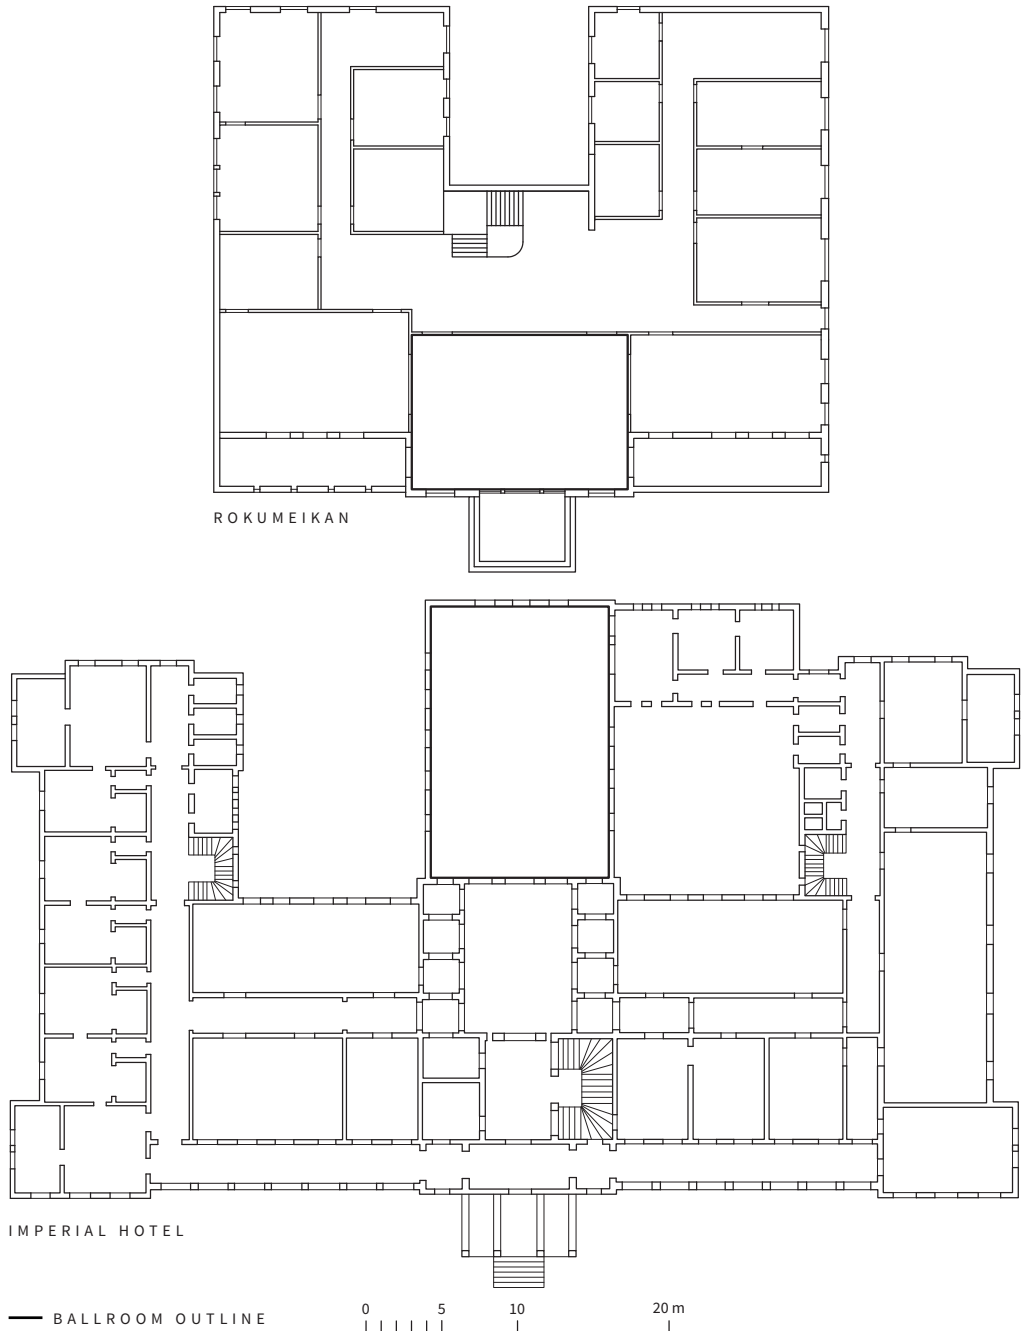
Comparison of the floor plan of the Rokumeikan, opened in 1883 and the Imperial Hotel, opened in 1890 on two adjacent premises next to Hibiya Park. The outline of the ballrooms in both venues is highlighted.
